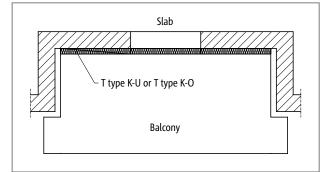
Schöck Isokorb® T type K-U/K-O: Balcony with façade recess
